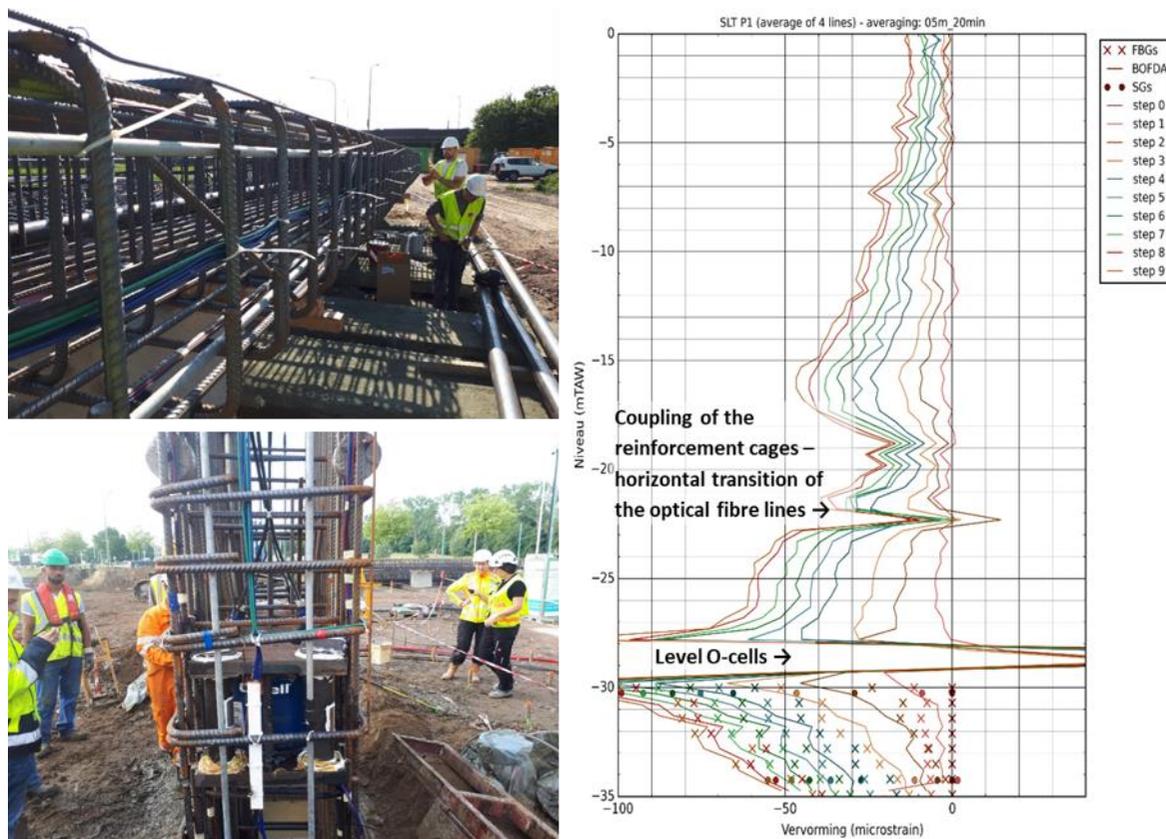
Instrumentation and O-cell load tests on diaphragm walls in Antwerp (Lantis)
